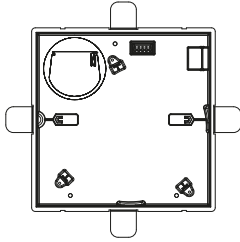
Flush-mounted Taris extractor fan installation positions, axial
